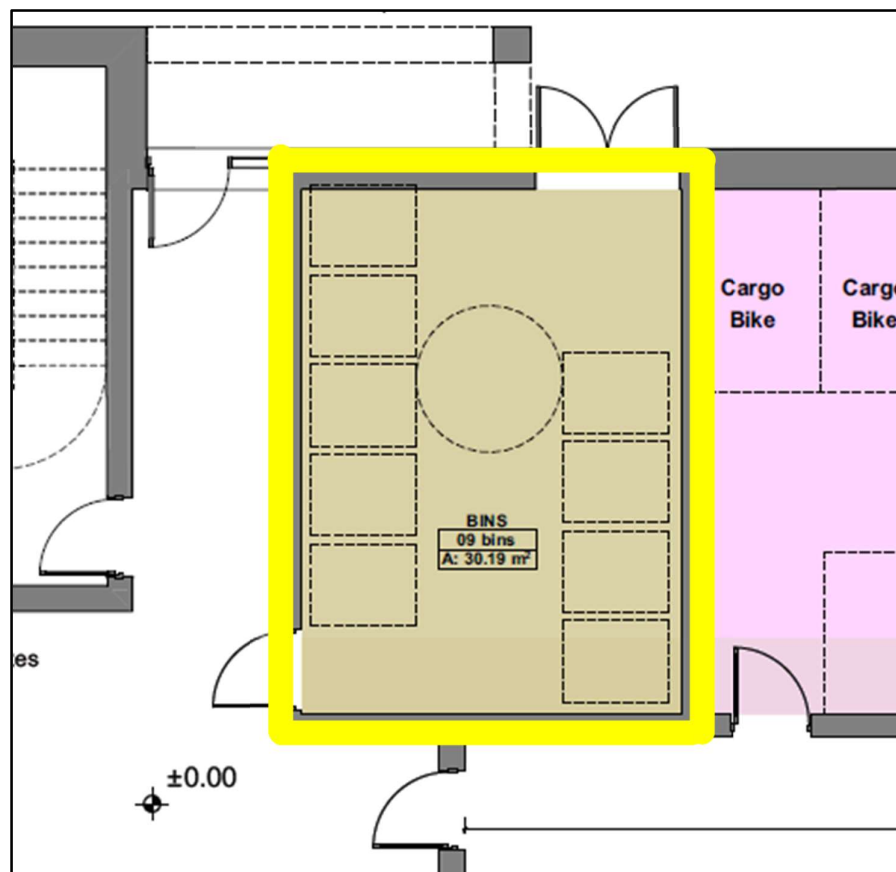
Internal Layout of Shared Waste Storage Area for Apartment Block C1 (Yellow) (Davey Smith Architects, 2025)
